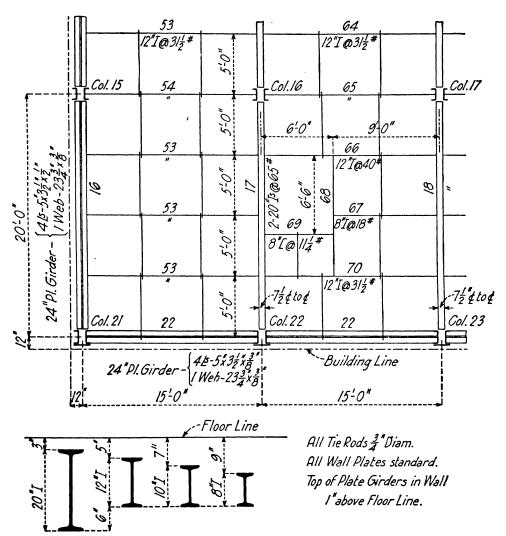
FLOOR PLANS FOR OFFICE BUILDINGS.
